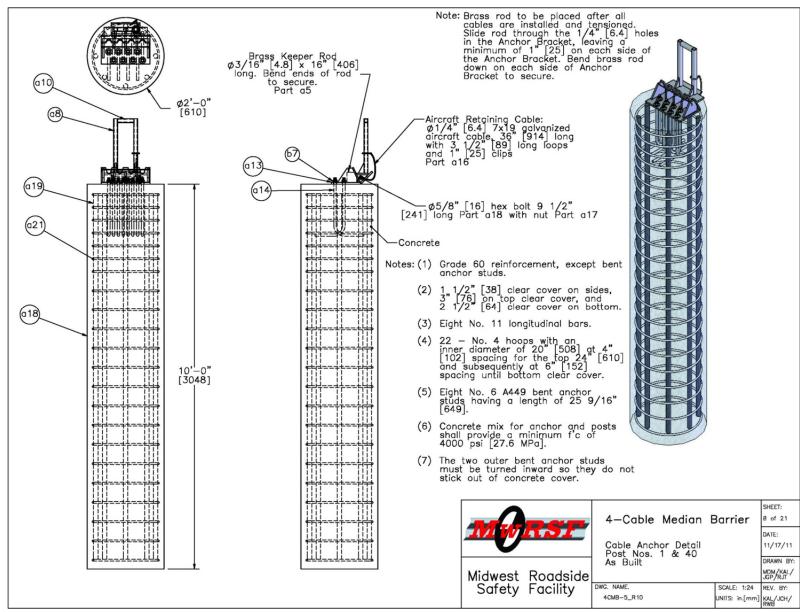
Post Nos. 1 and 40 Details, Test No. 4CMB-5
